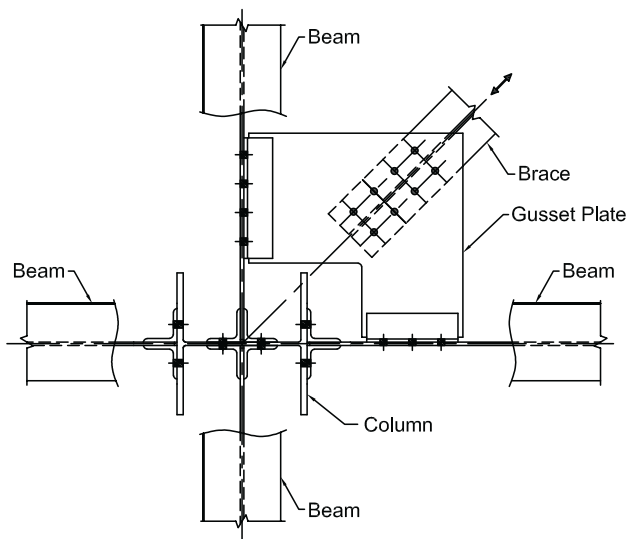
Horizontal bracing details, plan view: beam-to-column configuration.
